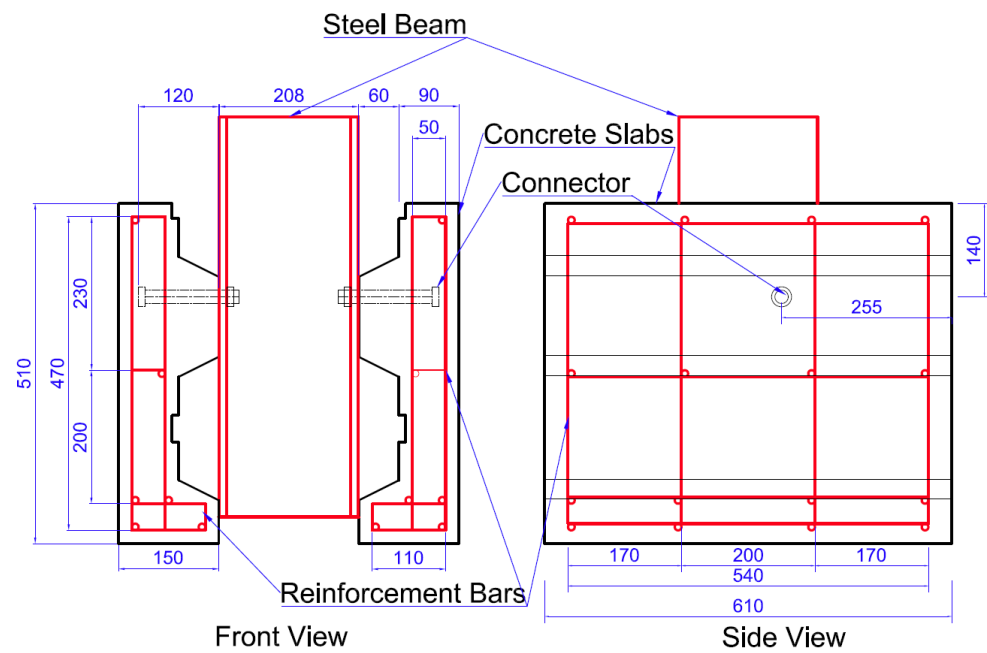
Push-off test specimen with single layer reinforcement cage (S) and two connectors per trough
